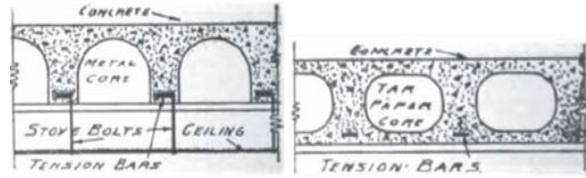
Cross Section of One-way Voided Slab with Hollow Core (Source: Mota, 2013)
